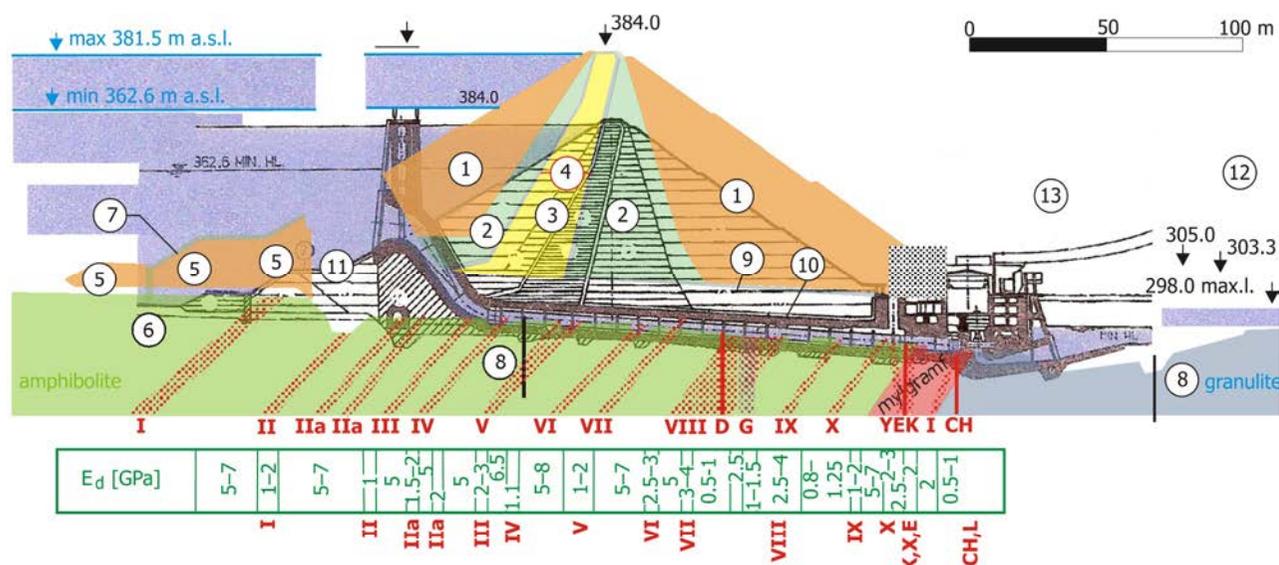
Longitudinal section of the intake, penstock and pumped storage hydroelectric plant of the Dalešice dam; 1 – rock-fill part of the dam, 2 – gravel transition part, 3 – loamy core, 4 – sand filters, 5 – upstream pools, 6 – watertight concrete diaphragm, 7 – watertight concrete facing of the upstream pool, 8 – grout curtain, 9 – reinforced-concrete constructions of penstocks, 10 – steel penstocks of 6,200 mm diameter, 11 – intake, 12 – pumped storage hydroelectric plant, 13 – power lines from the PSHEP
